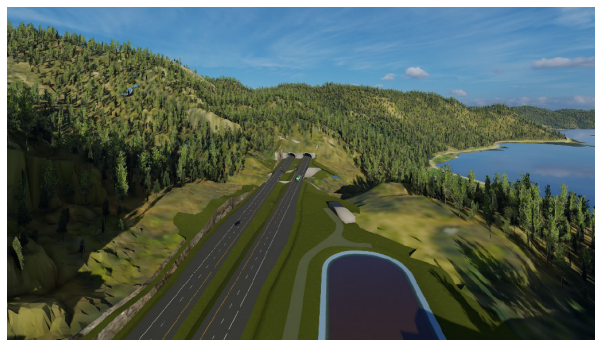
Tunnel portal West (Lene). The figure shows the planned landscape around the tunnel portal to the west (Lene).
